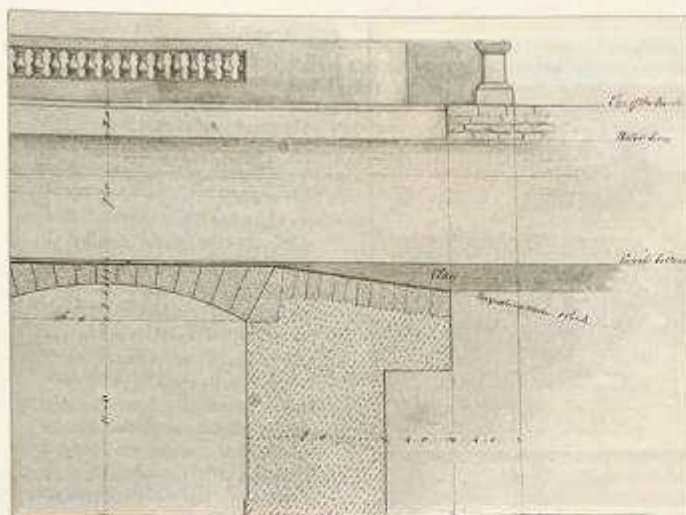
Longitudinal section of the Camelon aqueduct²⁹—the road underpass with its decorative façade³⁰ was replaced in the 19th century with a swing bridge
